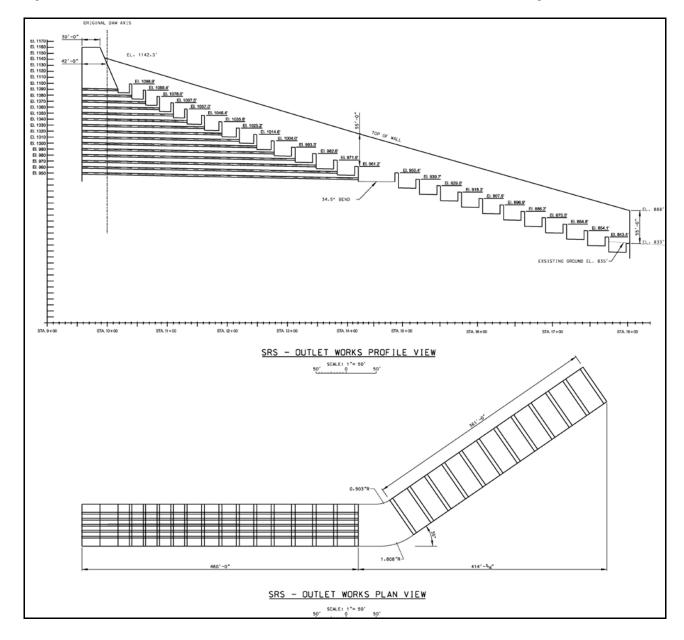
Section and Plan of Potential SRS Outlet Works Raised 160 feet, Configuration 1
